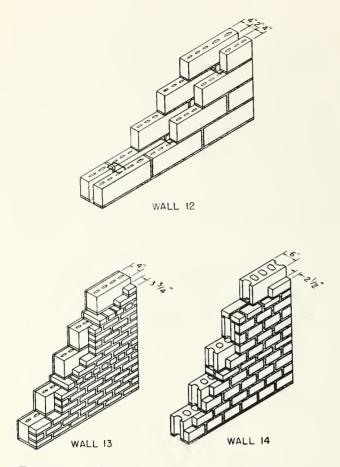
Construction of cavity-type and of brickfaced test walls.
